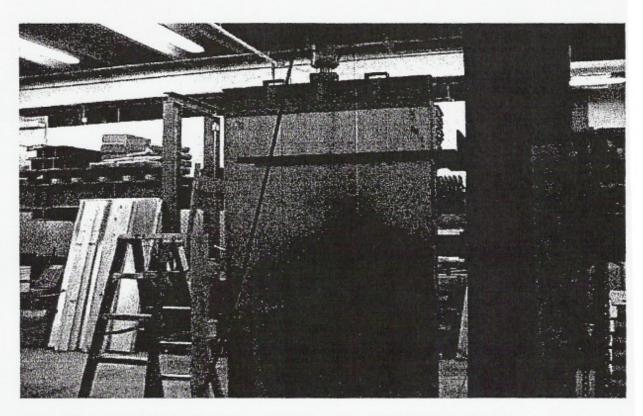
Test Setup for Compressive Loading 8' Galv.-Galv. Panel
